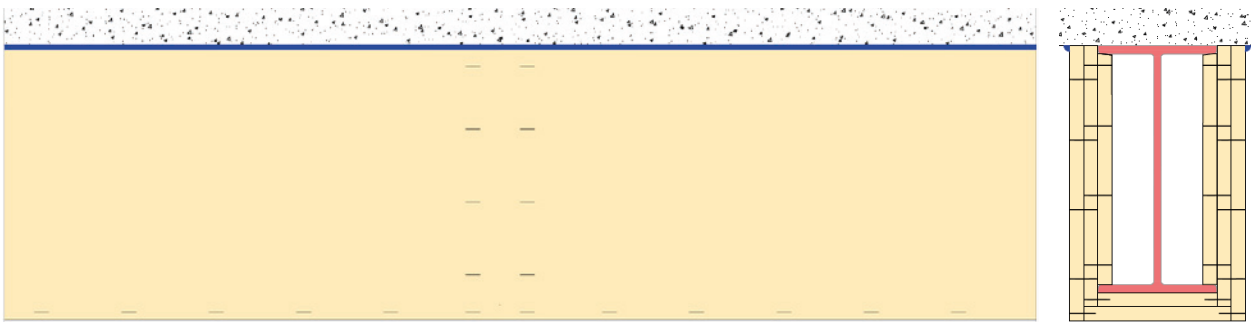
Elevation and cross-section view of Universal Steel Beam, showing completion of Knauf Fireboard installed
